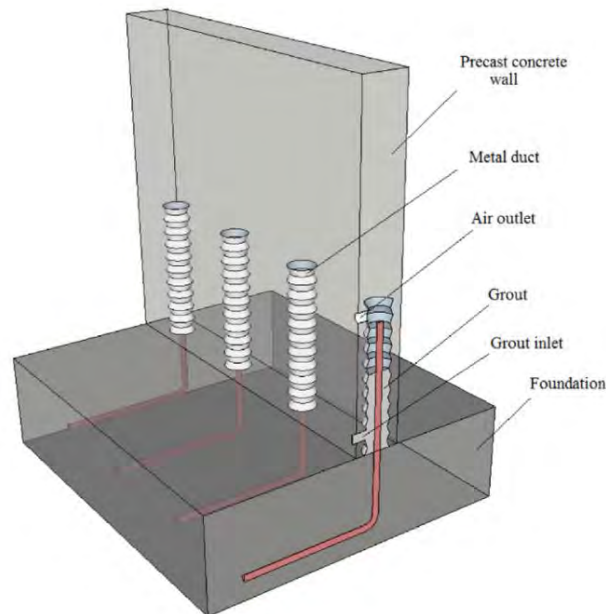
Typical horizontal connection layout with grouted splice sleeve [38]
